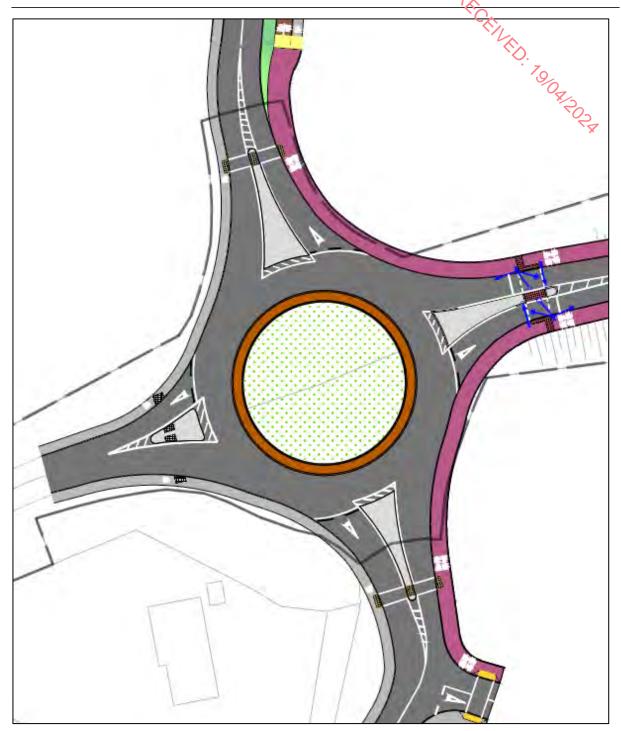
Bhailsigh Road (L1140) Access Roundabout - Proposed Modified Layout.
